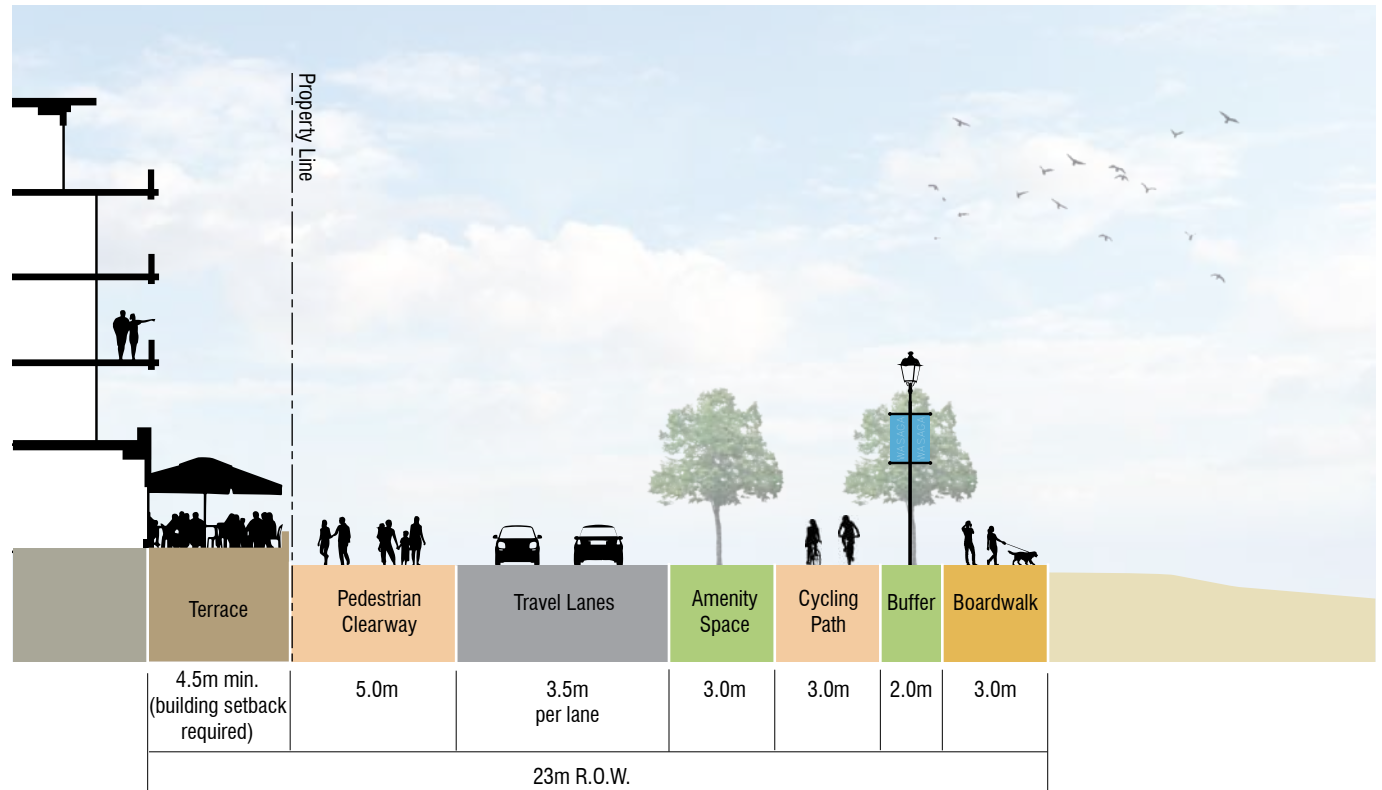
Beach Drive / Boardwalk Street Section (23.0m R.O.W.)
